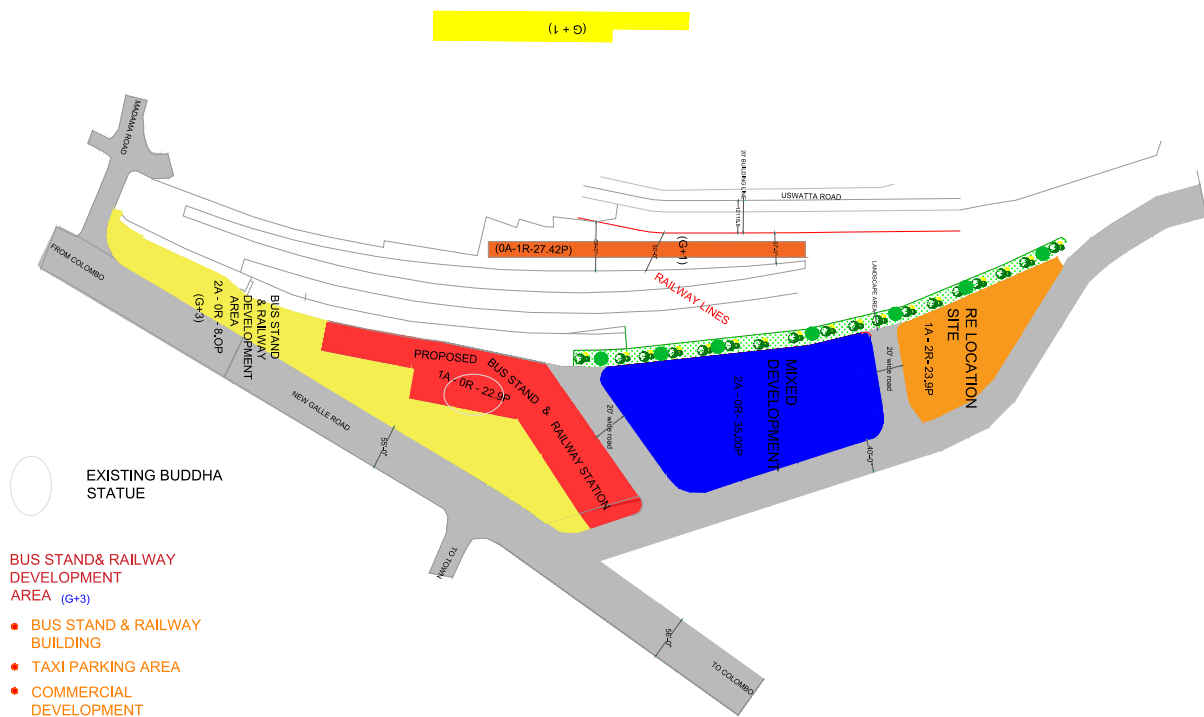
Proposed Multi-Modal Centre Plan
